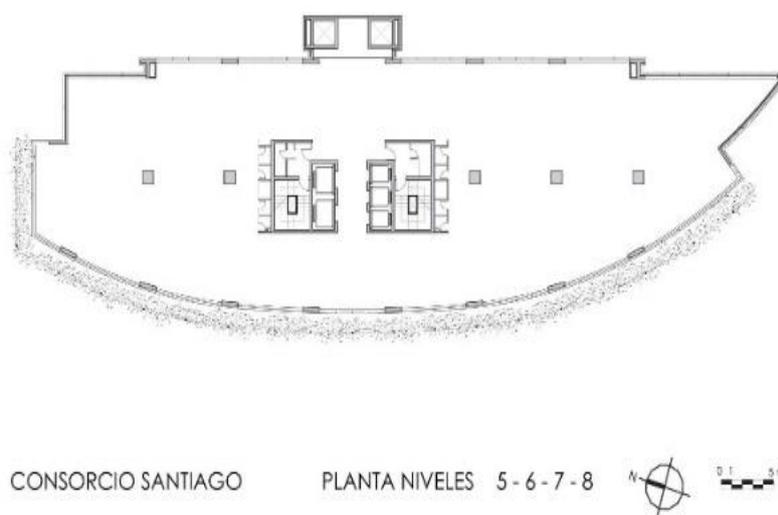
Typical floor of Consorico Santiago Building showing the GW location. [9]
